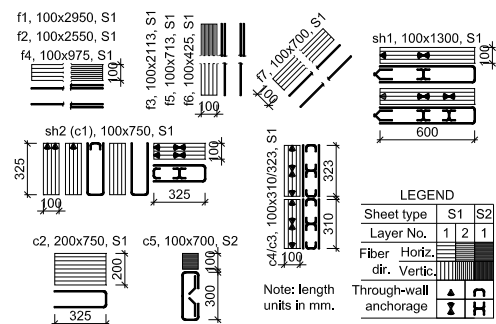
FRP layout for the PRCWP 6-S/E3-R/T specimen
